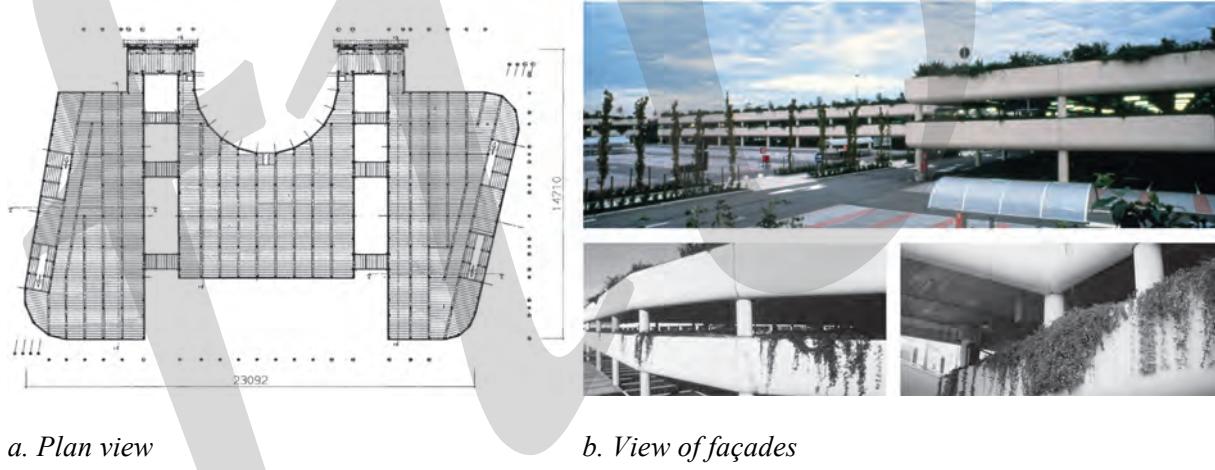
Layout of the floor and a view of the façades of an entirely precast car park with 2,500 places in Bologna, Italy
